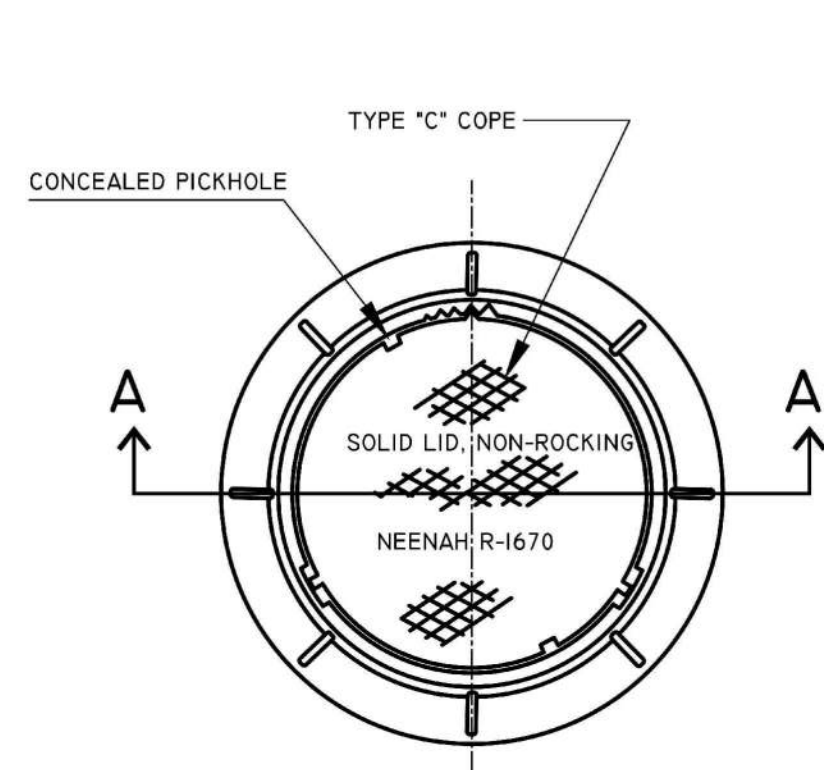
DETAILS OF TYPE "A" CATCH BASIN CASTING
